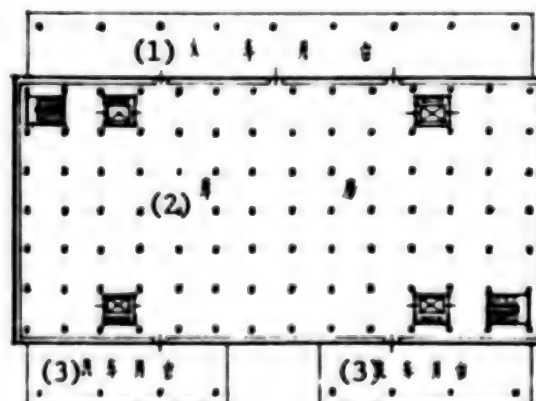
"Single Unit" Type Warehouse, Elevators Are Scattered Inside the Warehouse
